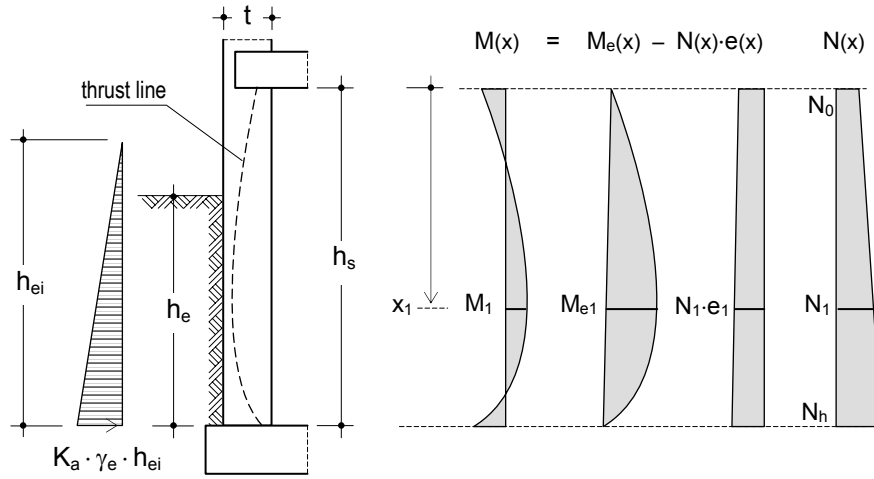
Loading and internal forces of uniaxially spanning basement walls with low imposed loads at the top
